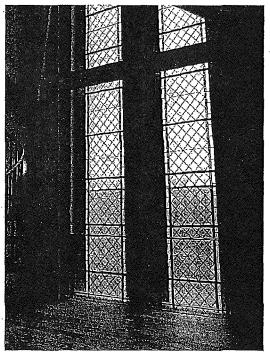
East tower, east windows after restoration (Page & Turnbull, 05/25/2018)
